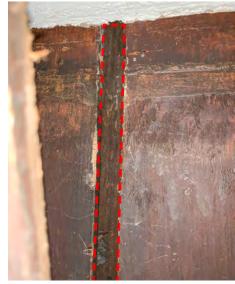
The area outlined in red is a section of the original east wall planks in the kitchen . It does not show any marks from previous plaster
